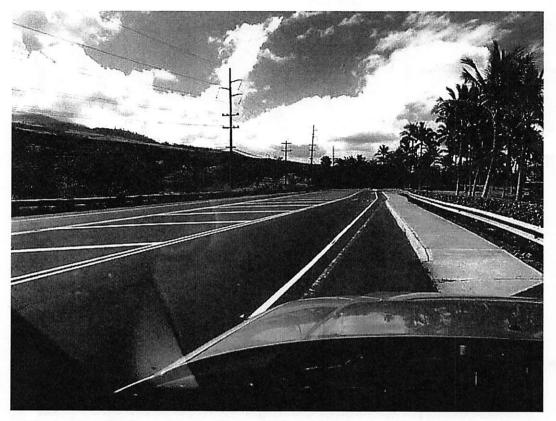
View South Along Pi'ilani Highway, Honua'ula on Left
